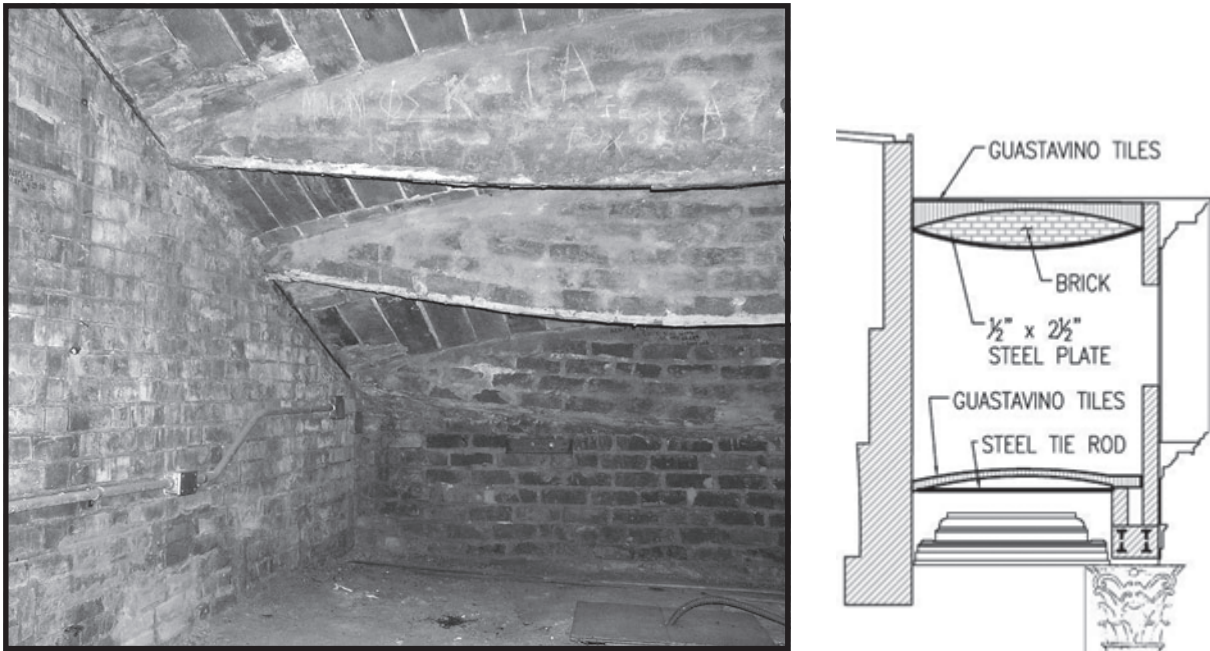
North portico attic (M401), and section through the attic showing the structural elements.
